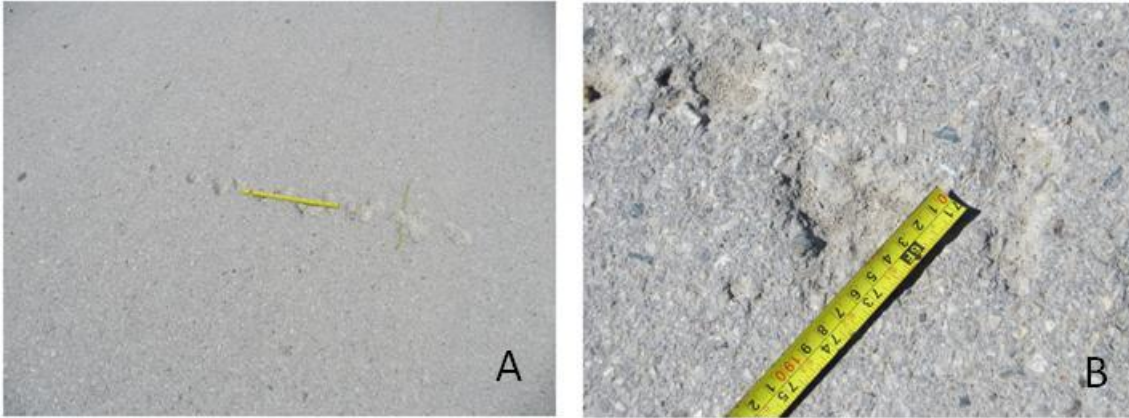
SB – Construction Equipment Damage (A) and Initiation of Pothole (B)
